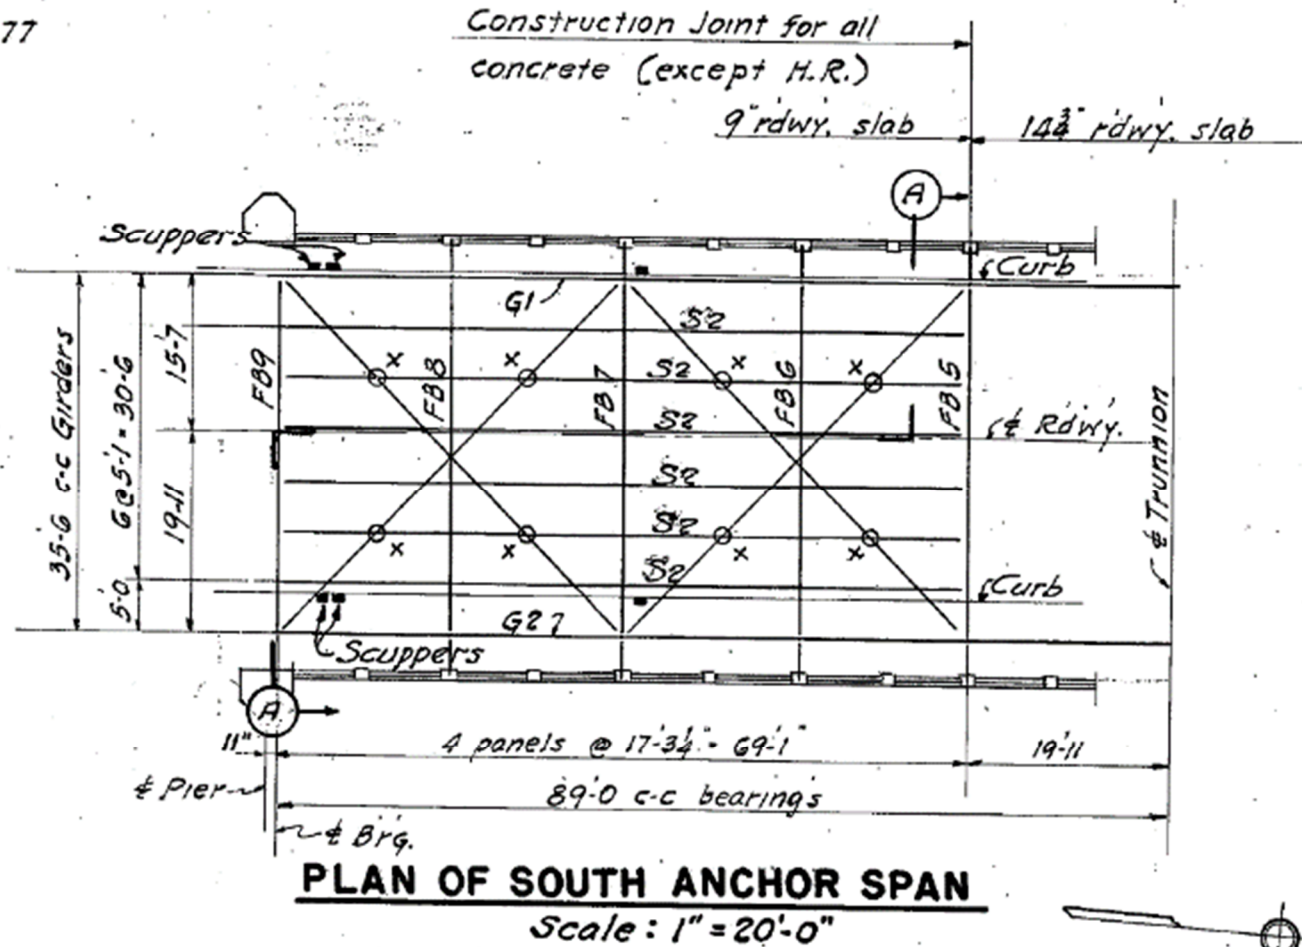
Framing Plan of Flanking Span (1939 As-Built Plans)
